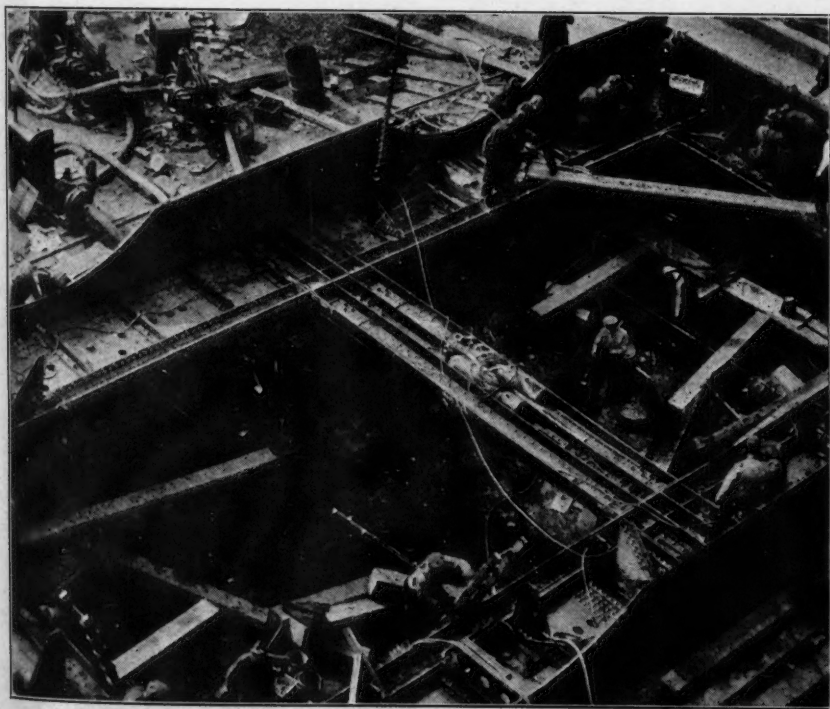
BEGINNING OF STEEL ERECTION ON FRONT STREET CAISSON.
